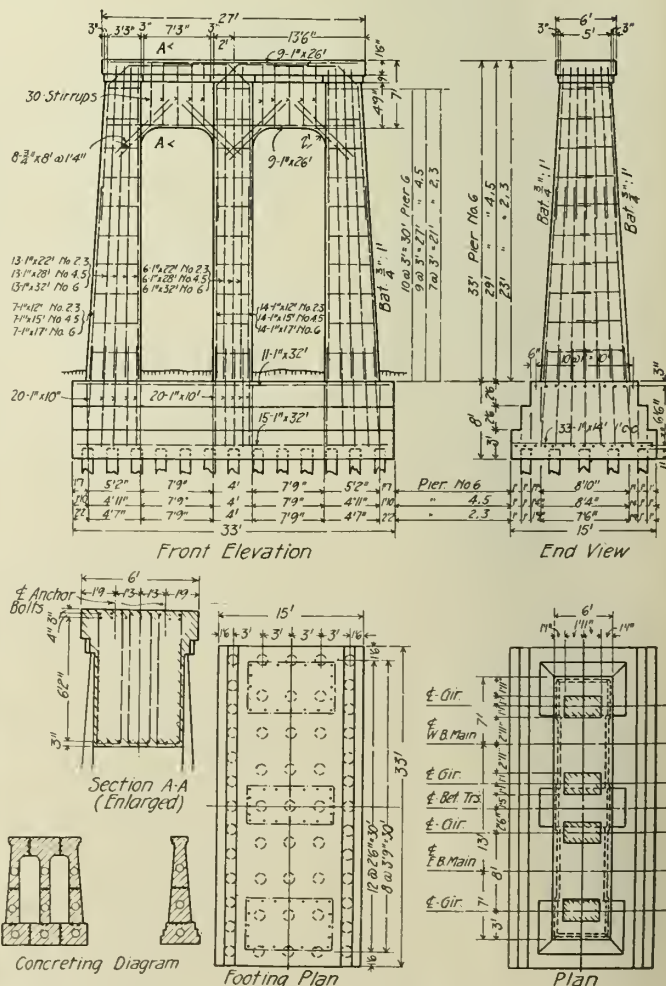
Details of Piers, 2-6 Inc., Manning Viaduct, C., M. & St. P. Ry.
